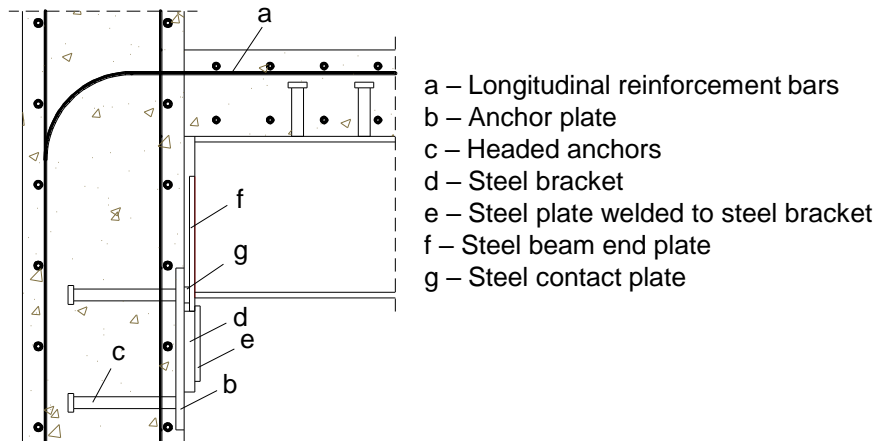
Composite beam to reinforced concrete wall joint configuration studied in [1]
